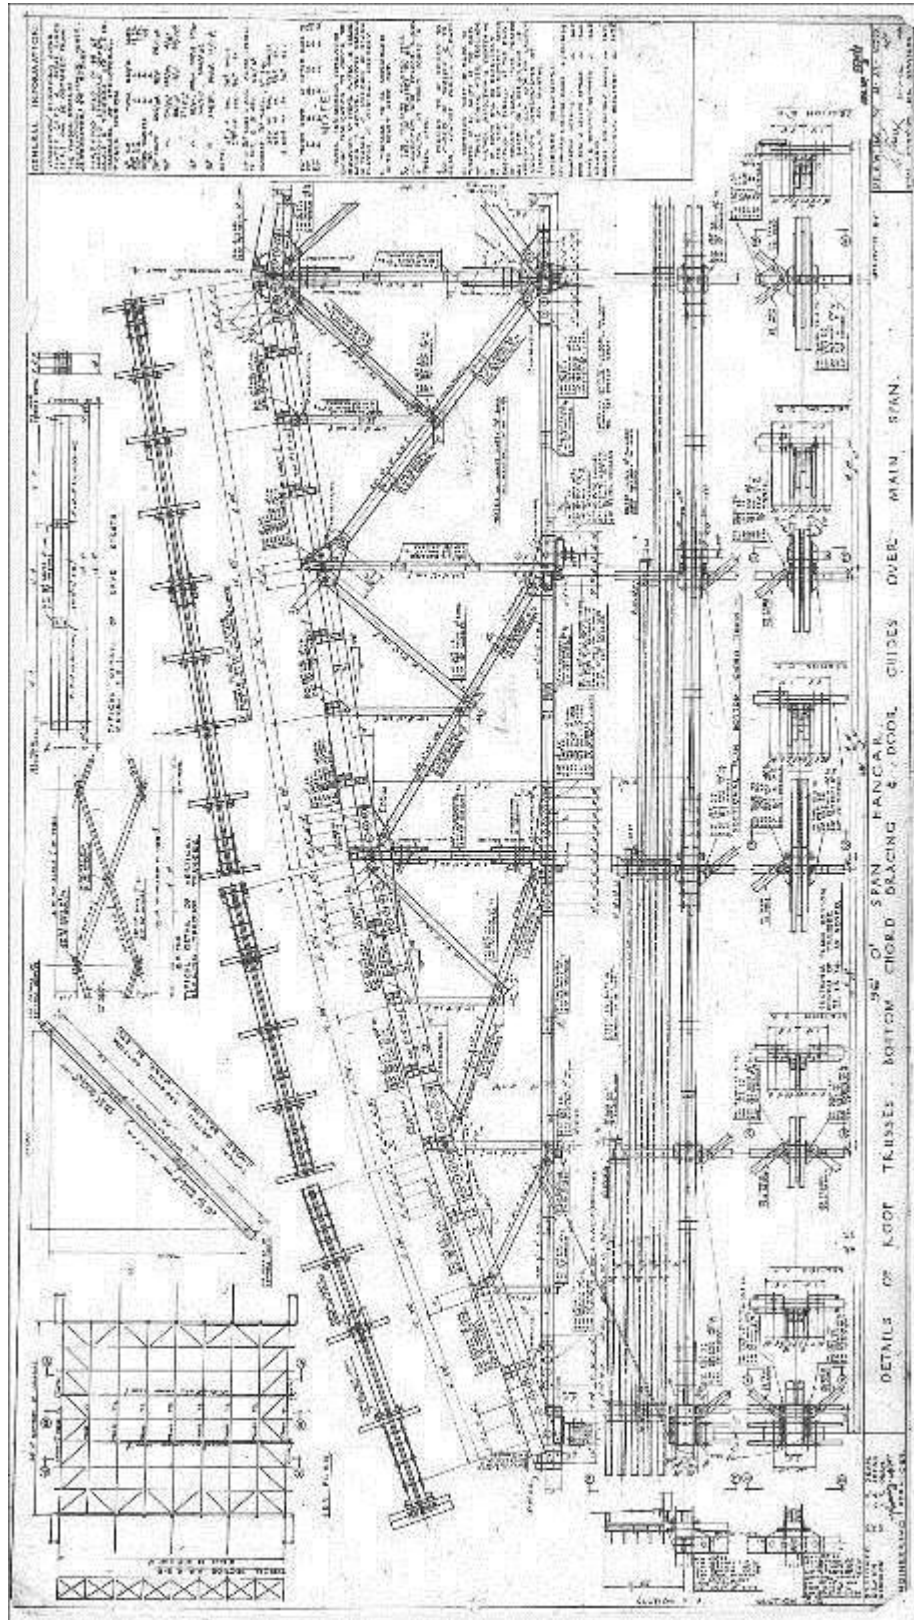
Detailed Drawing of the Roof Truss for Hangar 2
